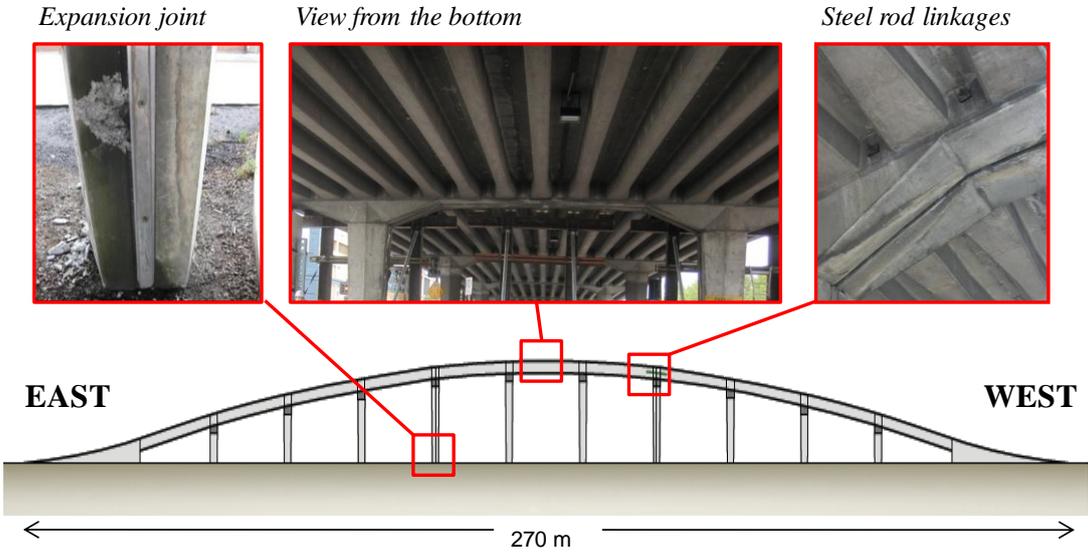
Moorhouse Avenue Overpass. Sketch of the bridge elevation with location of the expansion joints and steel rod linkages (Palermo et al. 2011).
